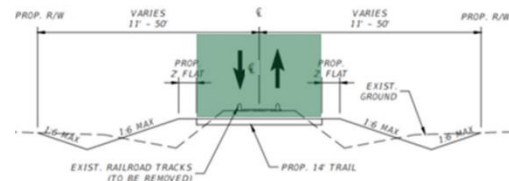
Existing and Proposed Cross Sections showing proposed right of way
